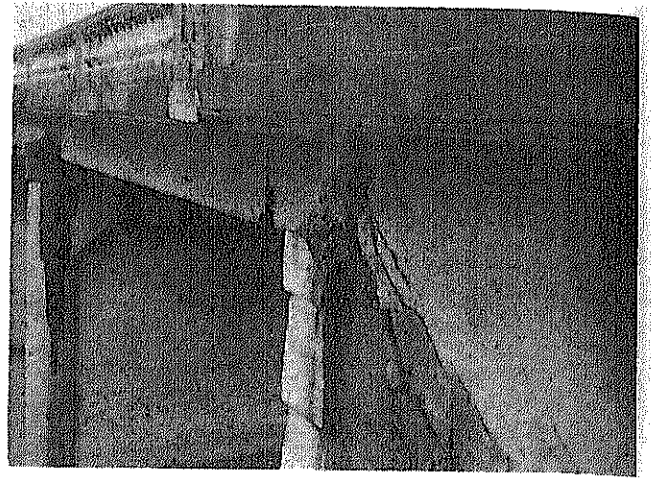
Damage to left bank abutment of S. Rita Bridge
